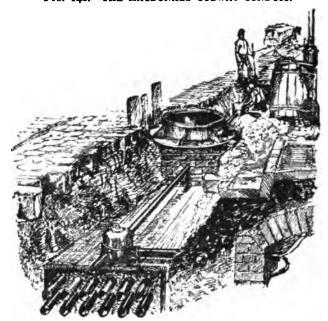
ELECTRIC CONDUIT IN CONSTRUCTION.
